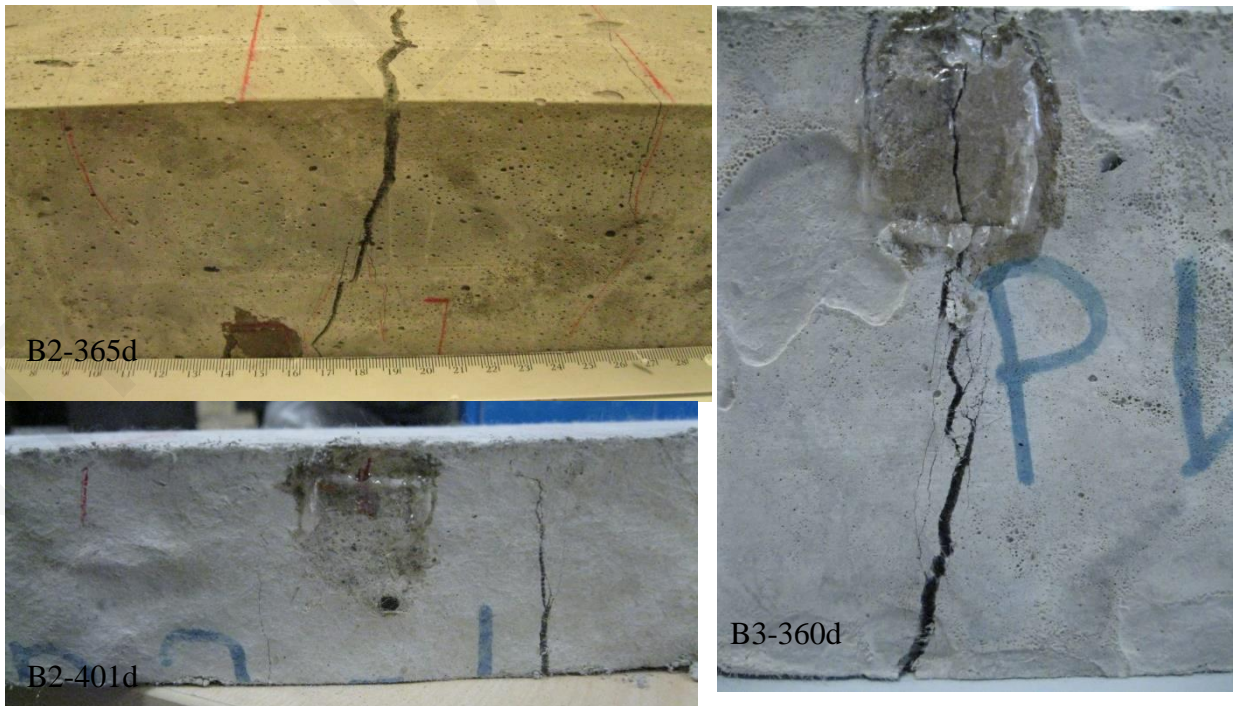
Failure modes of four point bending tests on beams without a notch
